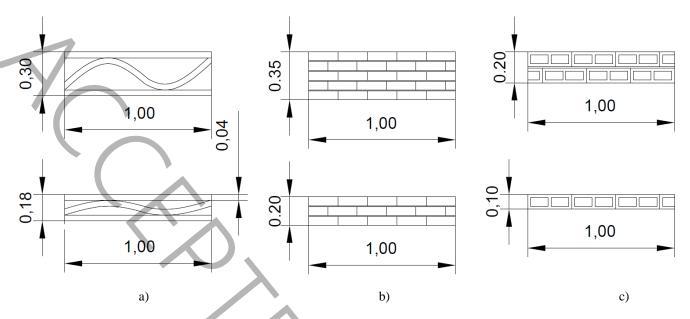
Details of internal and external walls of different construction methods; a) 3DPC, b) masonry structures, c) concrete and metal structures
